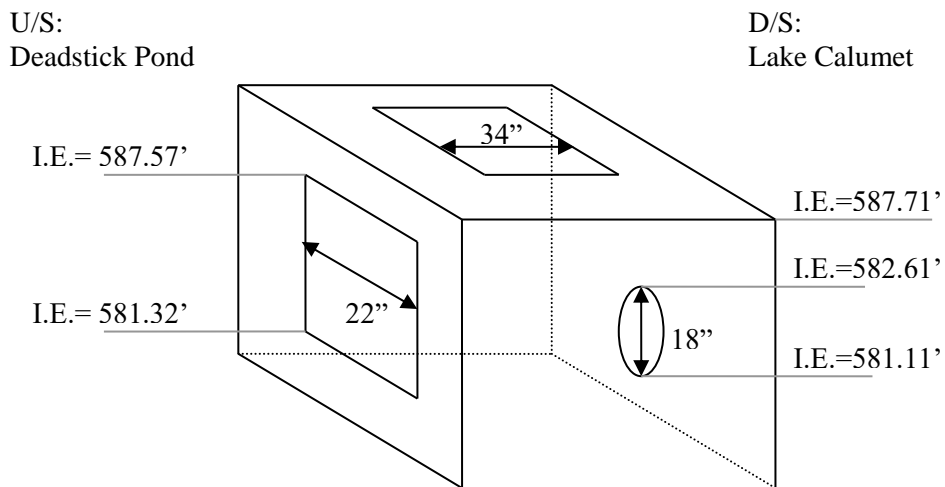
A drop inlet structure connecting the Deadstick Pond area to Lake Calumet (Structure 8).
